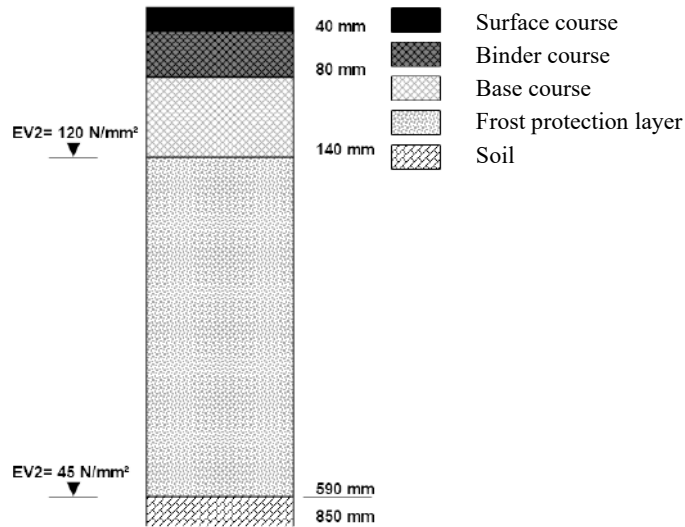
Layer arrangement of the construction for the pavement service life calculations
